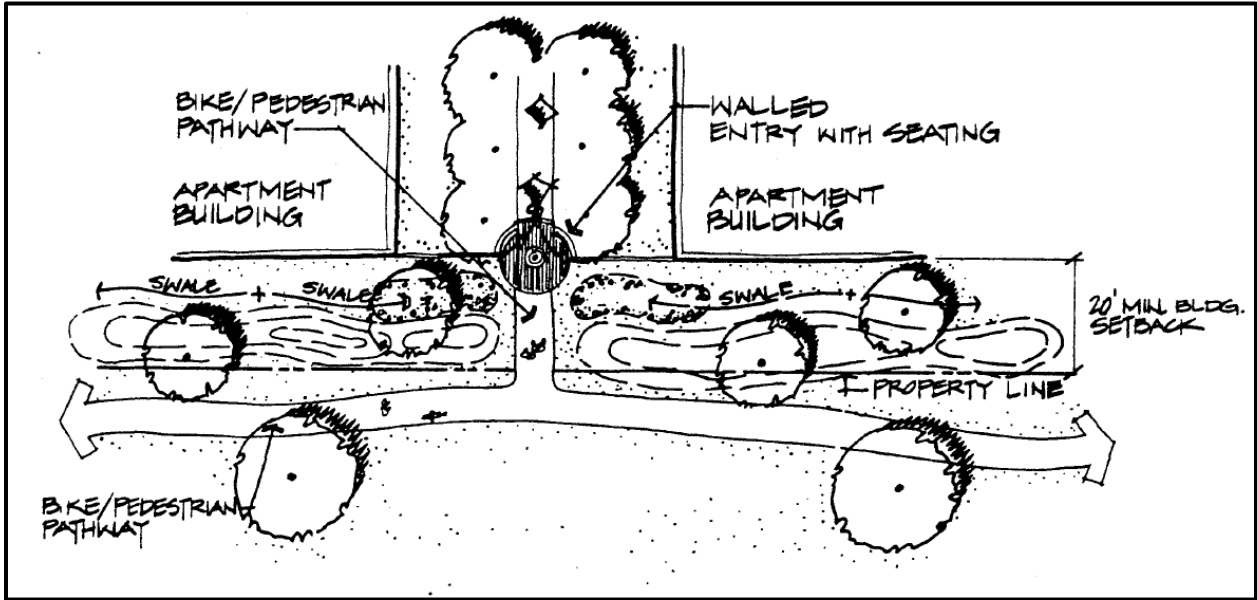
PLAN VIEW - Park Interface at Multi-Family Residential
